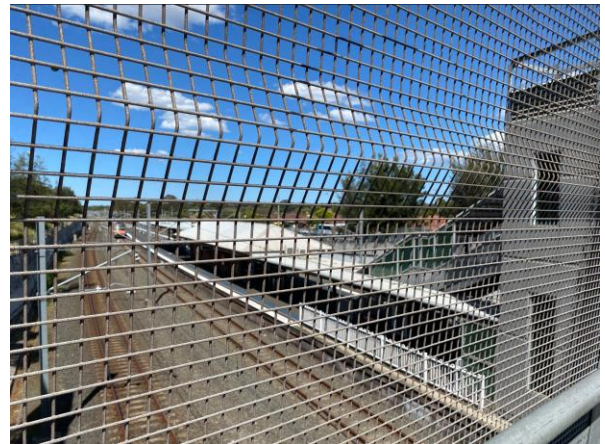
Beverly Hills station viewed from King Georges Road, note lift on right and siting of station below roadway level.
